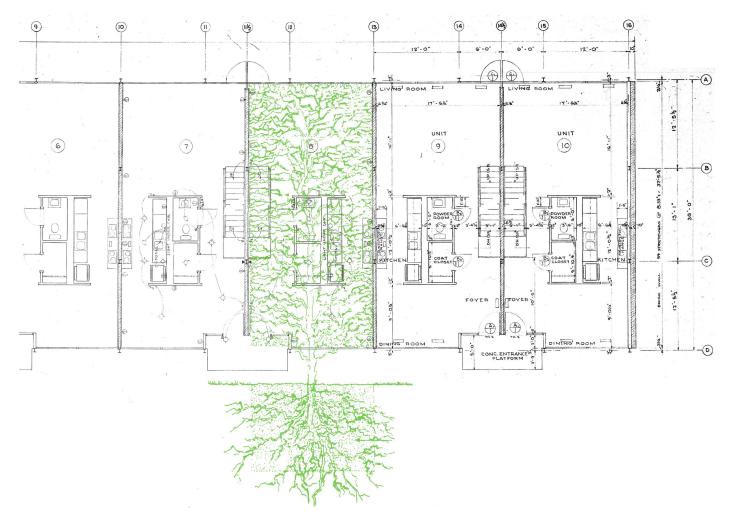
Collage of Caldwell's Hawthorne Hedge with Mies' Lafayette Park townhouse floorplan.
